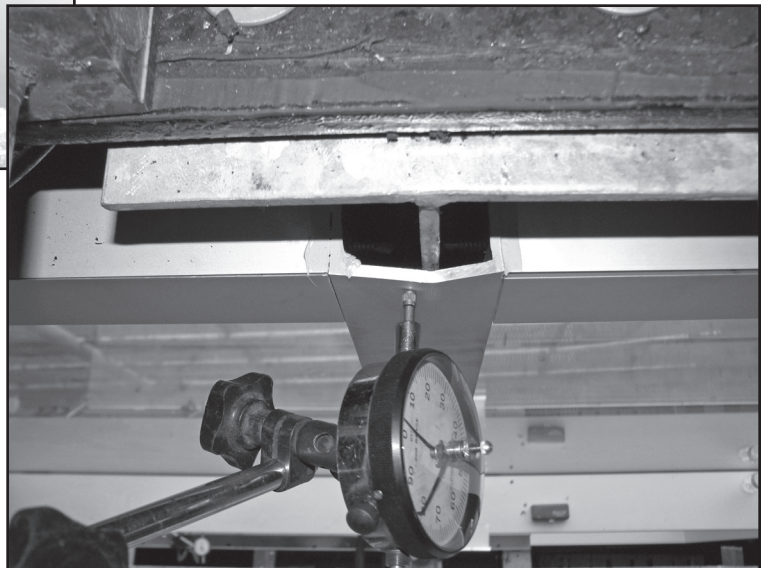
Structural failure at mullion connection of stick-framed curtain wall.
